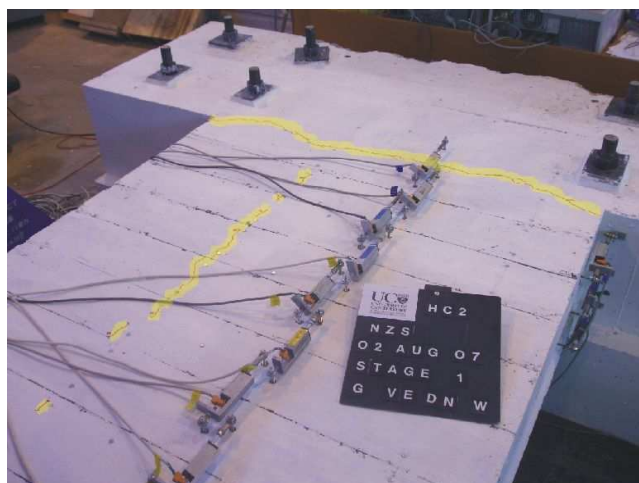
Specimen HCW1 during Stage One of testing after the beam-floor interface had cracked
